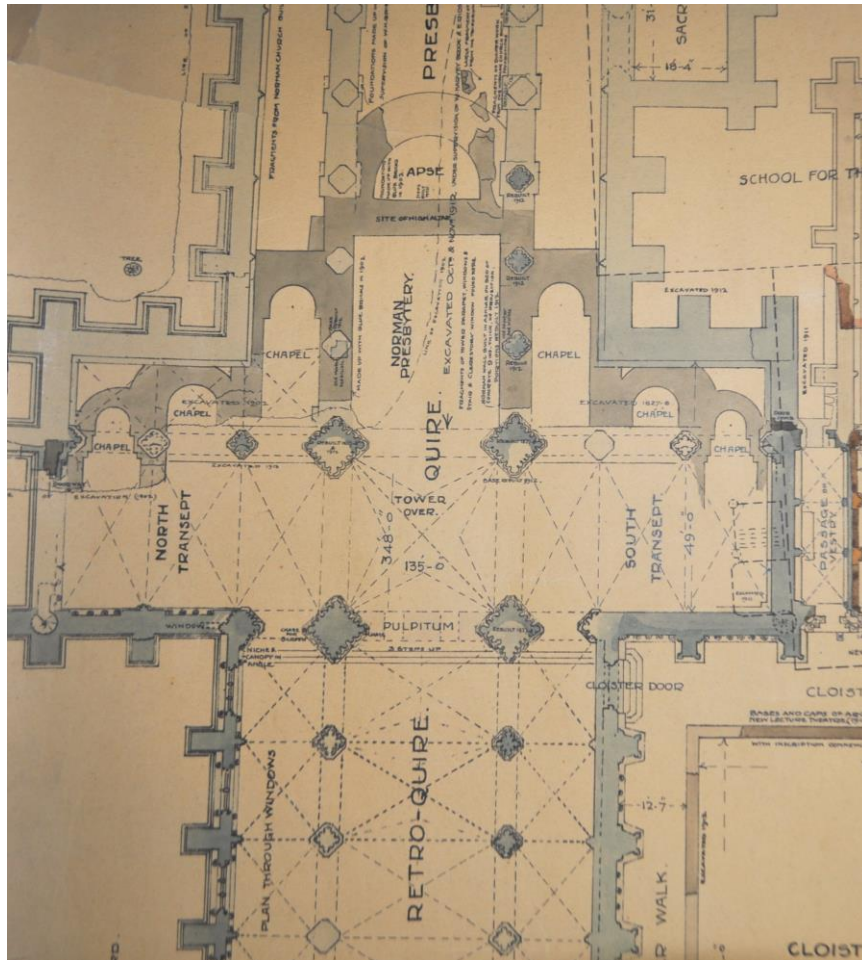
Central section of the Abbey church plan, as drawn by Edwin Ridsdale Tate, 1912, based on plans originally published by G.T. Andrews and R.H. Sharpe, 1827-8.
